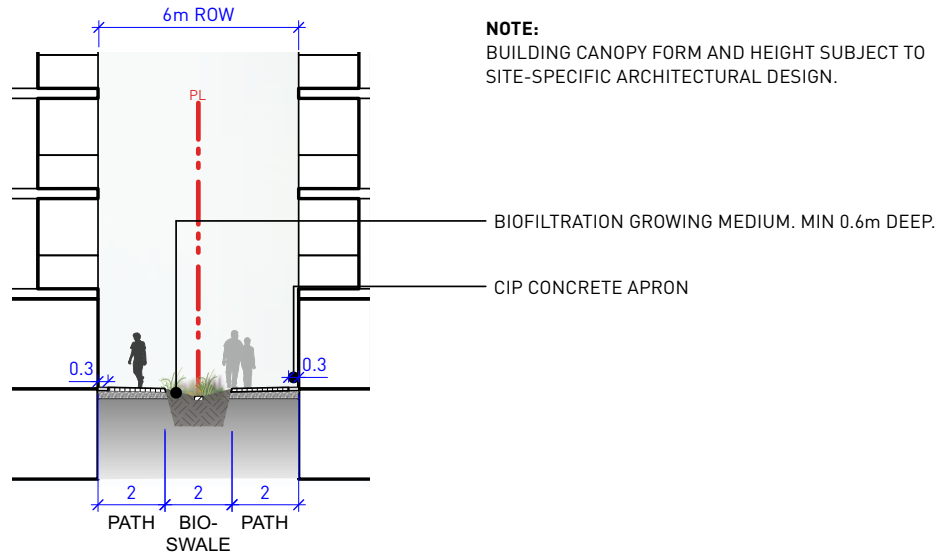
SECTION 1 - BIOSWALE WITH DRAIN
